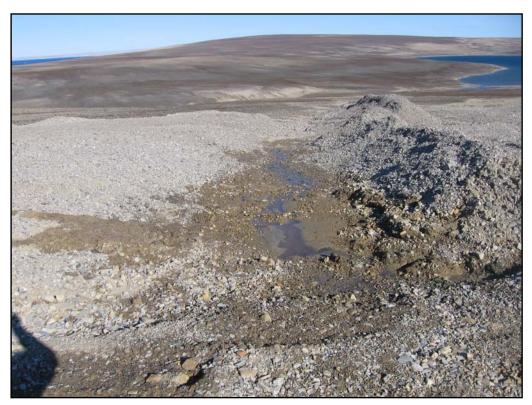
Northing: 8370978 Easting: 560105 Elevation: 60 m. Frustration Lake access road; repaired erosion gully with water bar
